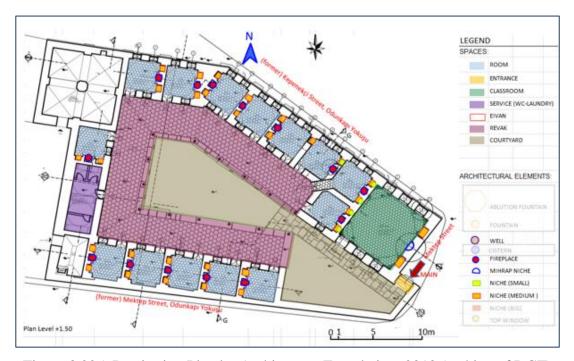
Restitution Plan by Architecture Foundation, 2010 (archive of DGF)
